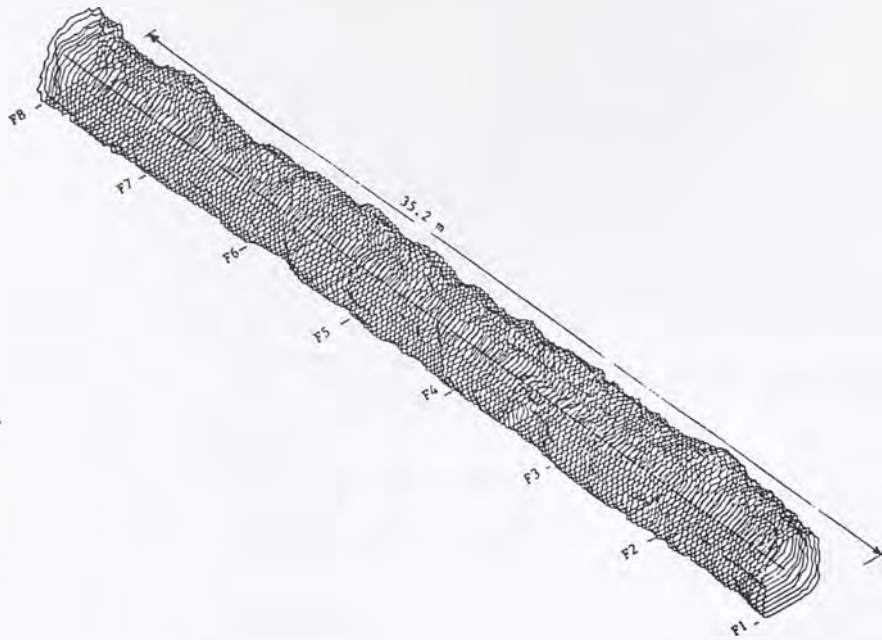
Isometric View of the Test Section I (35.2 m Long)
